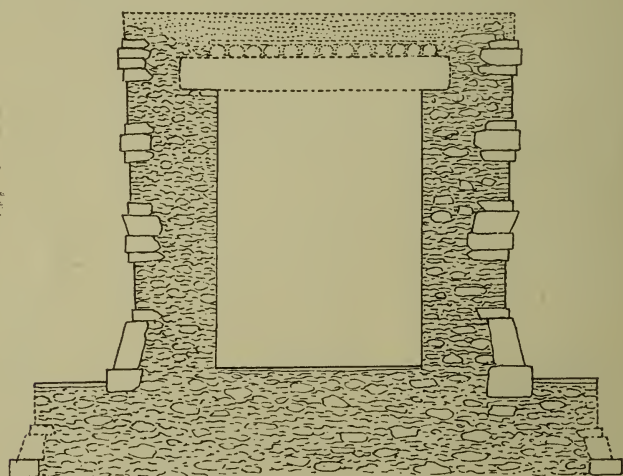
TRANSVERSE SECTION OF BUILDING OF SINGLE BEAM SPAN.
